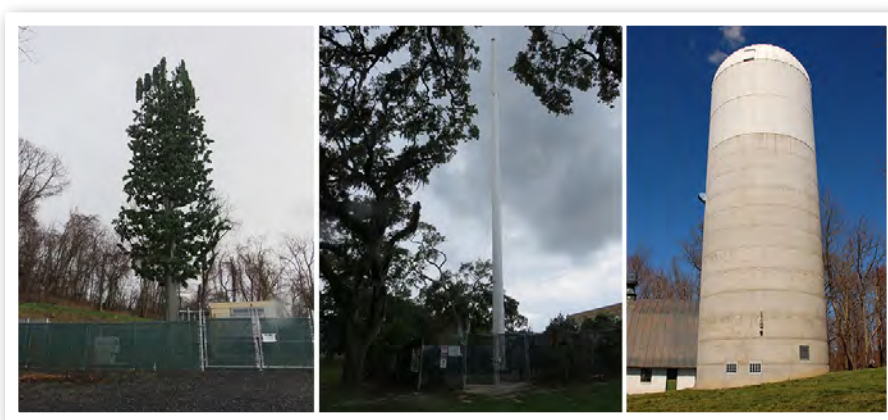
Faux Tree, Unipole, Faux Silo Concealed Towers
